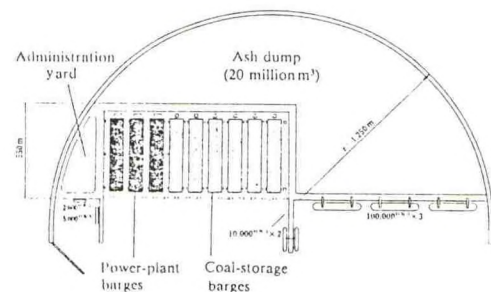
Layout of Floating-type Man-made Island -- (water depth 20 m, power plant with coal storage yard)
